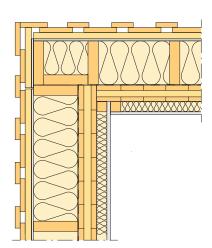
Design principle for corners of external walls, horizontal cross-section.
